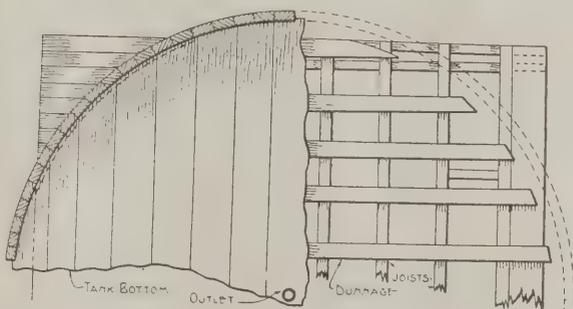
Half Plan of Platform with Floor at Corners and Bottom Broken Away to Show Supporting Timbers
